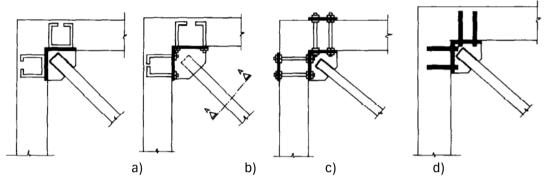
Connection used in the frame and bracing, a and b are used during construction and c and d are used after the construction of the frame [41].
